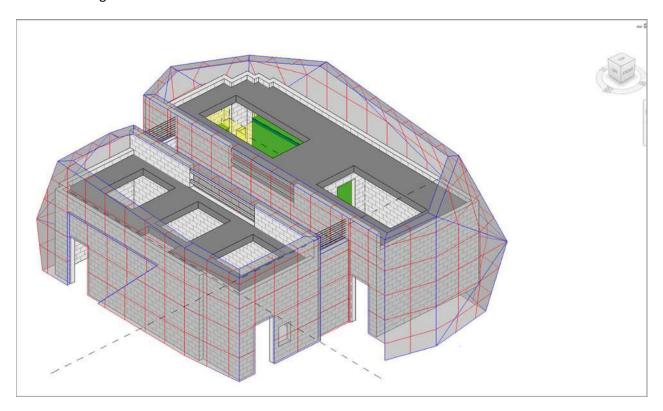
Original CMU Building with Ornamental Skin (from Heller Manus Architects)
